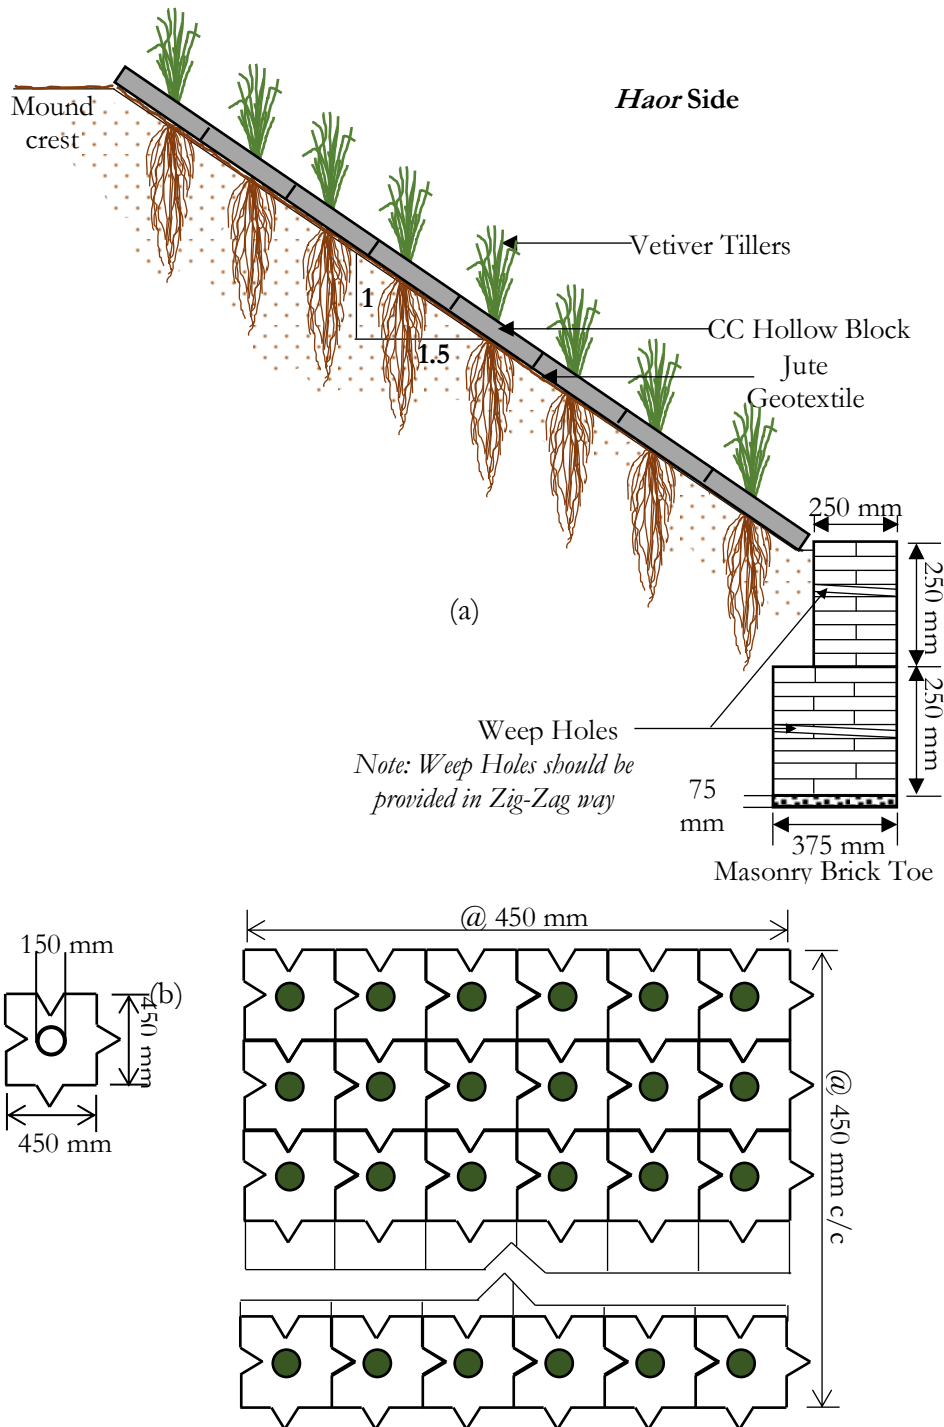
Schematic Drawing of Design Type III, (a) Cross Sectional View; and (b) Plan View (Redrawn from HILIP, 2017)
